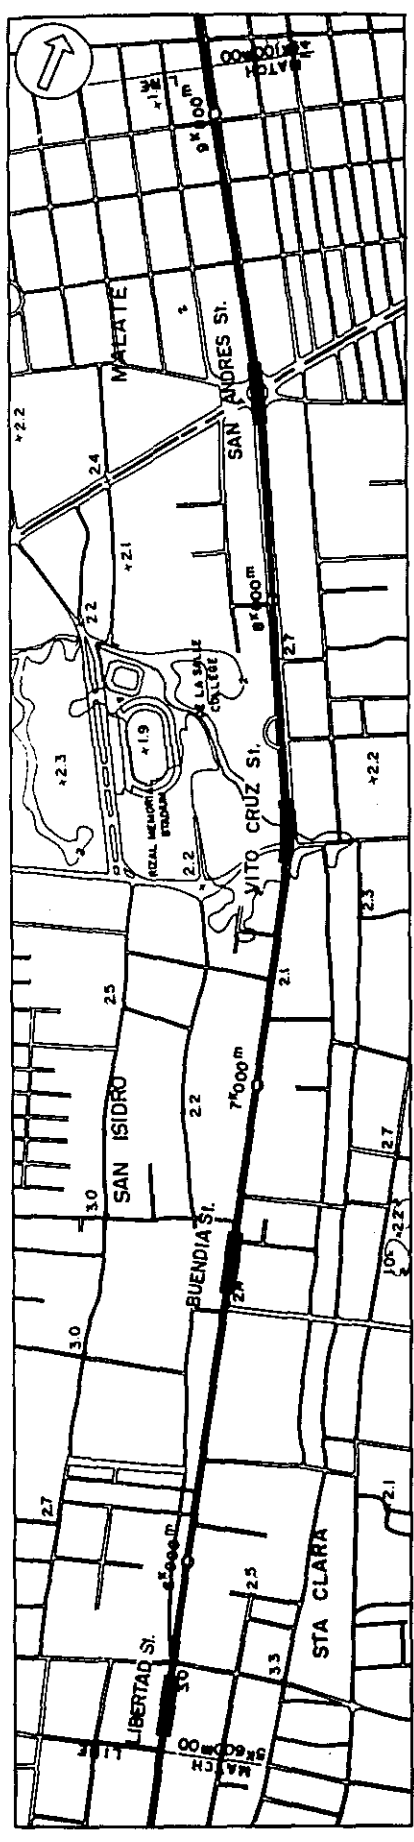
Plan and Profile for Elevation of Taft Avenue (2)
